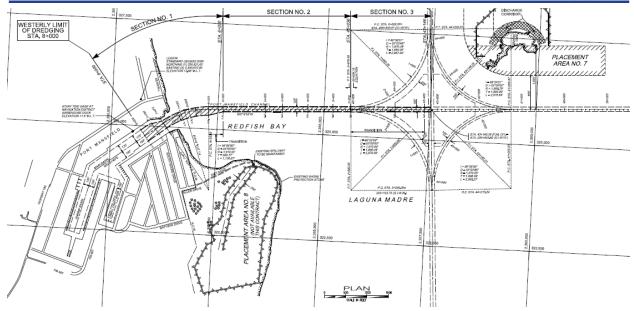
Detailed Layout of Proposed Dredging Project (-12 feet, after USACE)
